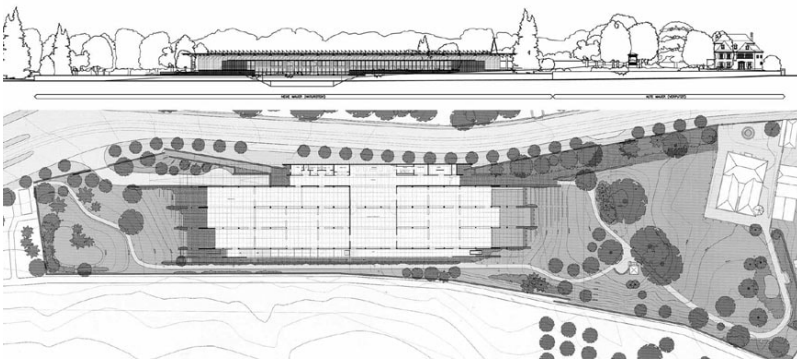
Beyeler Foundation. Site and section. The longitudinal axis is North-South.
